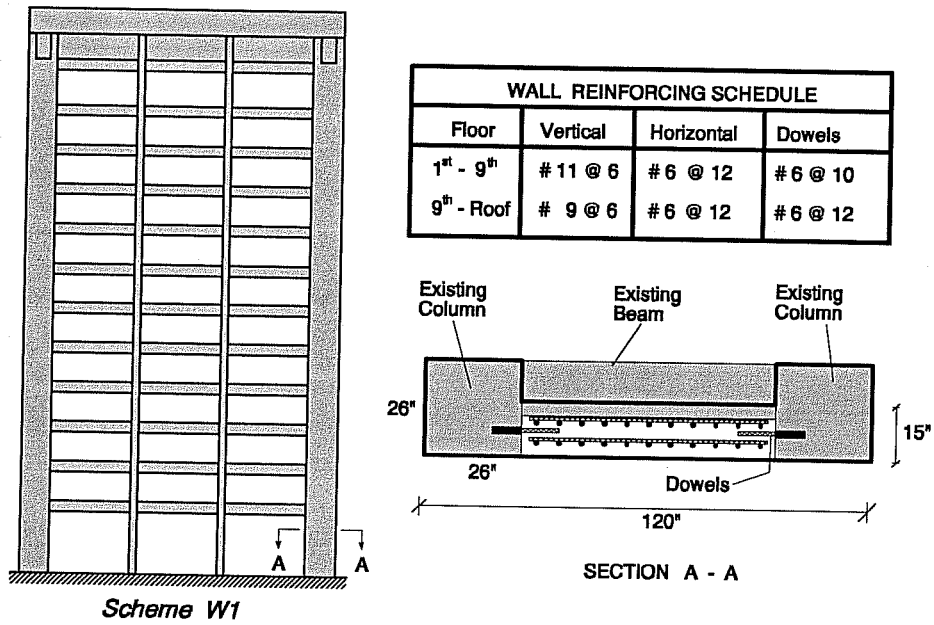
Cross section dimensions and reinforcing details of structural wall scheme W1 for the twelve-story building.
